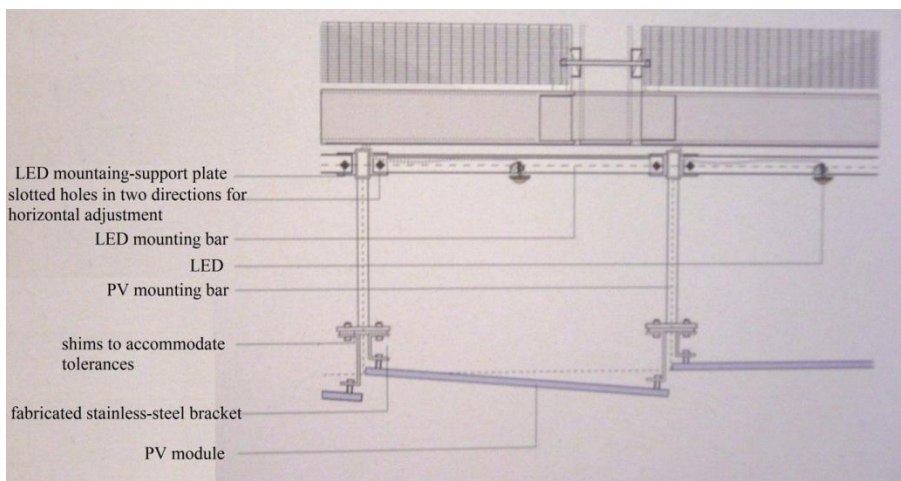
Plan detail for mounting LEDs and PV modules on the Xicui Entertainment Complex façade (Robert and Guariento, 2009).
